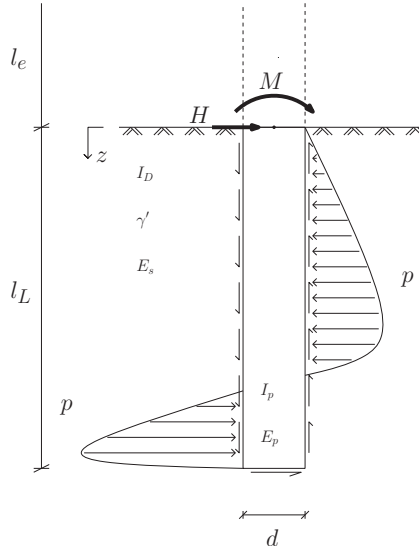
Sketch of forces acting on a laterally loaded pile
